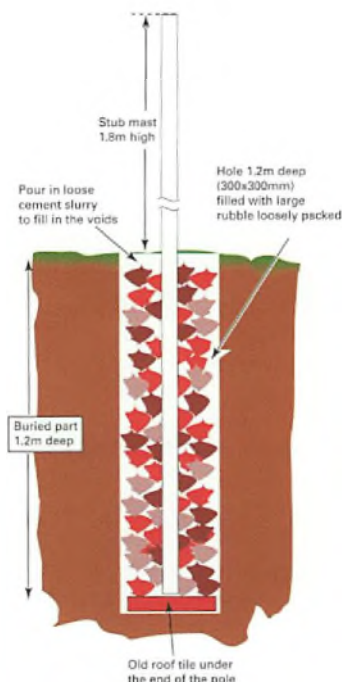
Line diagram of concrete foundations for scaffold pole stub mast.
